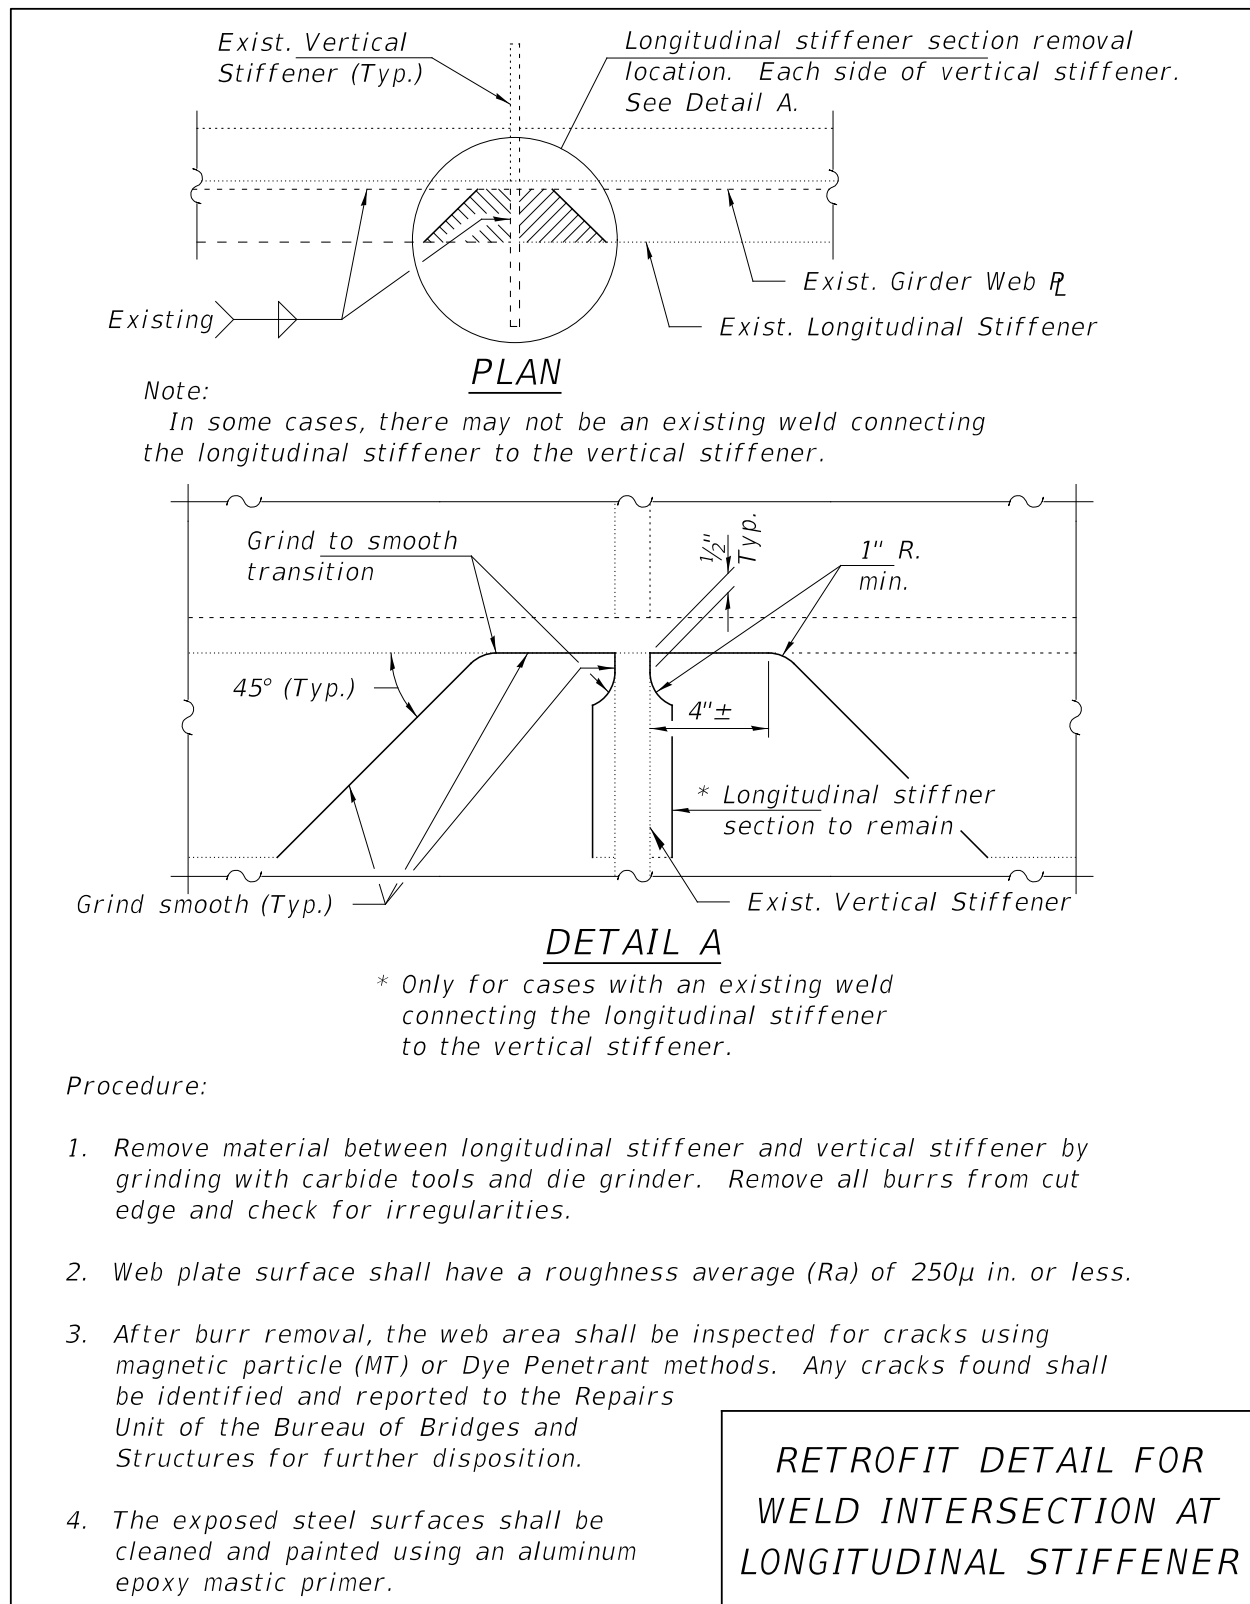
Retrofit Detail for Weld Intersection at Longitudinal Stiffener
